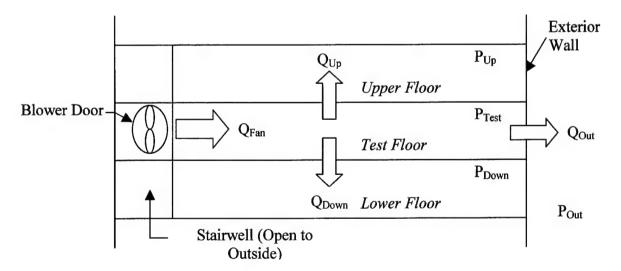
Floor-by-floor blower door Testing Method Schematic
